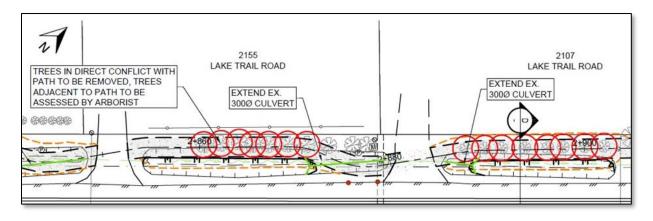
Vegetation removal and culvert extensions required at 2155 Lake Trail Road alongside a drainage ditch.
